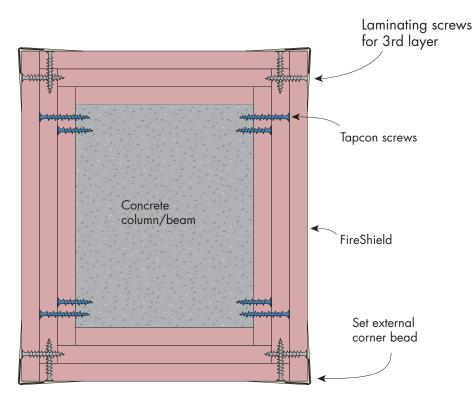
4 Sided Protection Concrete Column Elevation or plan view
